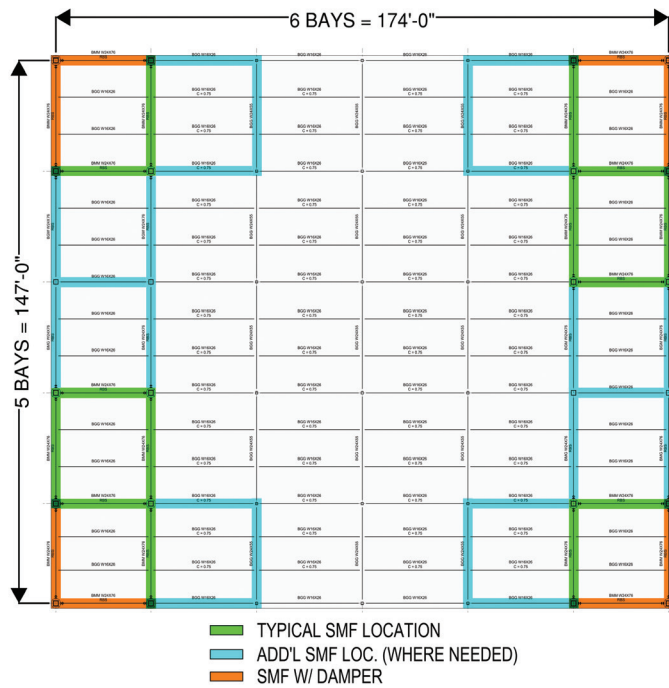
The archetype 6-story building in the case study has the same rectangular floor plan. Dampers were added to the corners of each floor.
